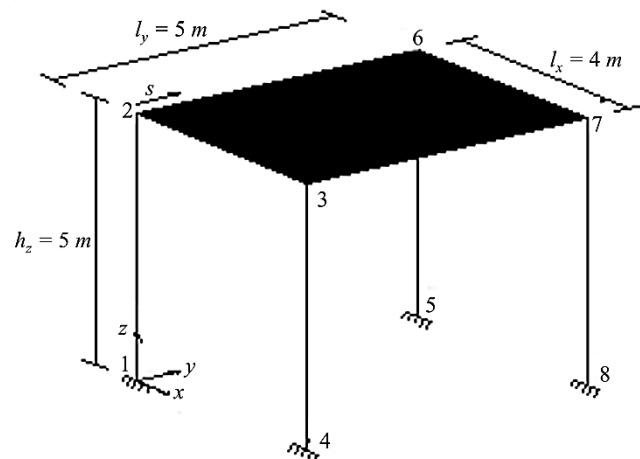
Spatial frame with beams, columns and a floor slab.
